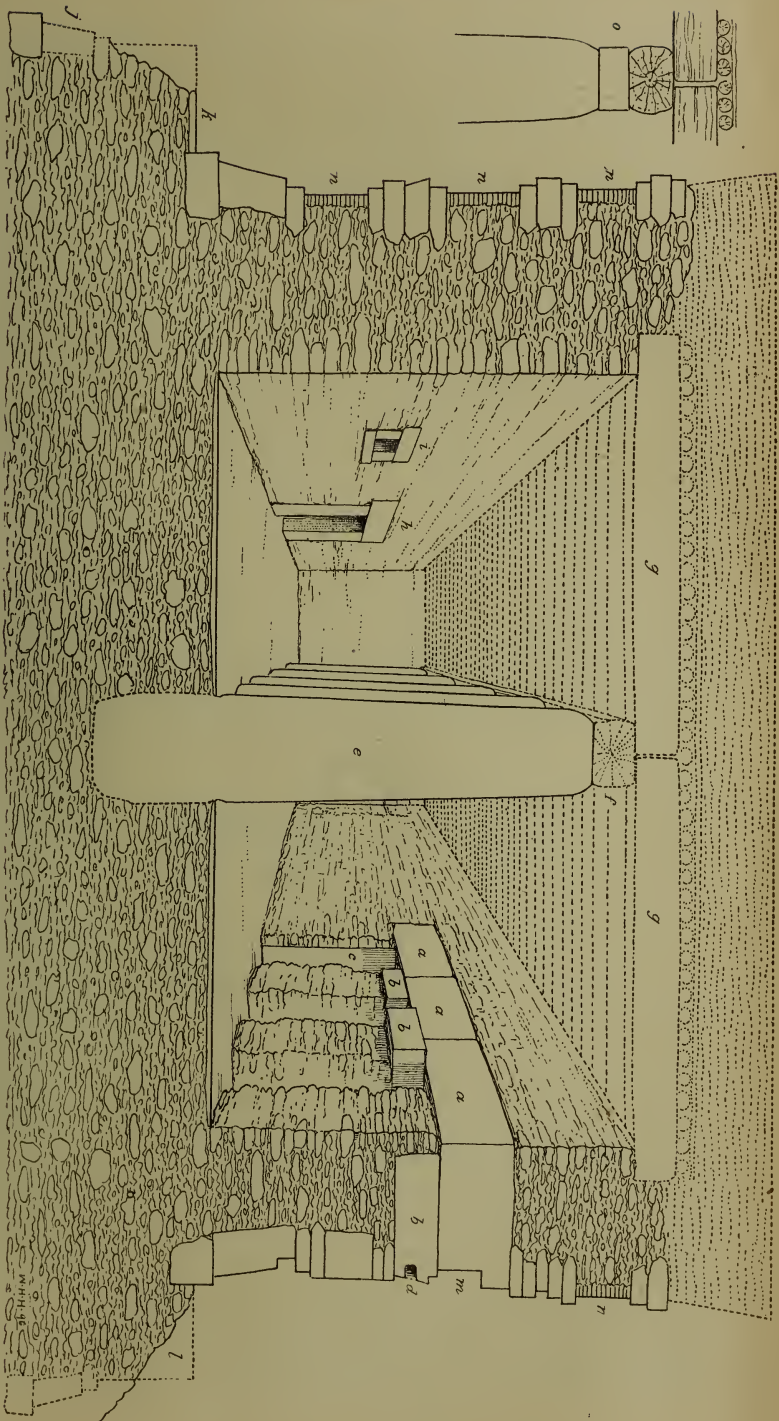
SECTION AND PERSPECTIVE OF THE HALL OF THE SIX COLUMNS; LOOKING EAST.
